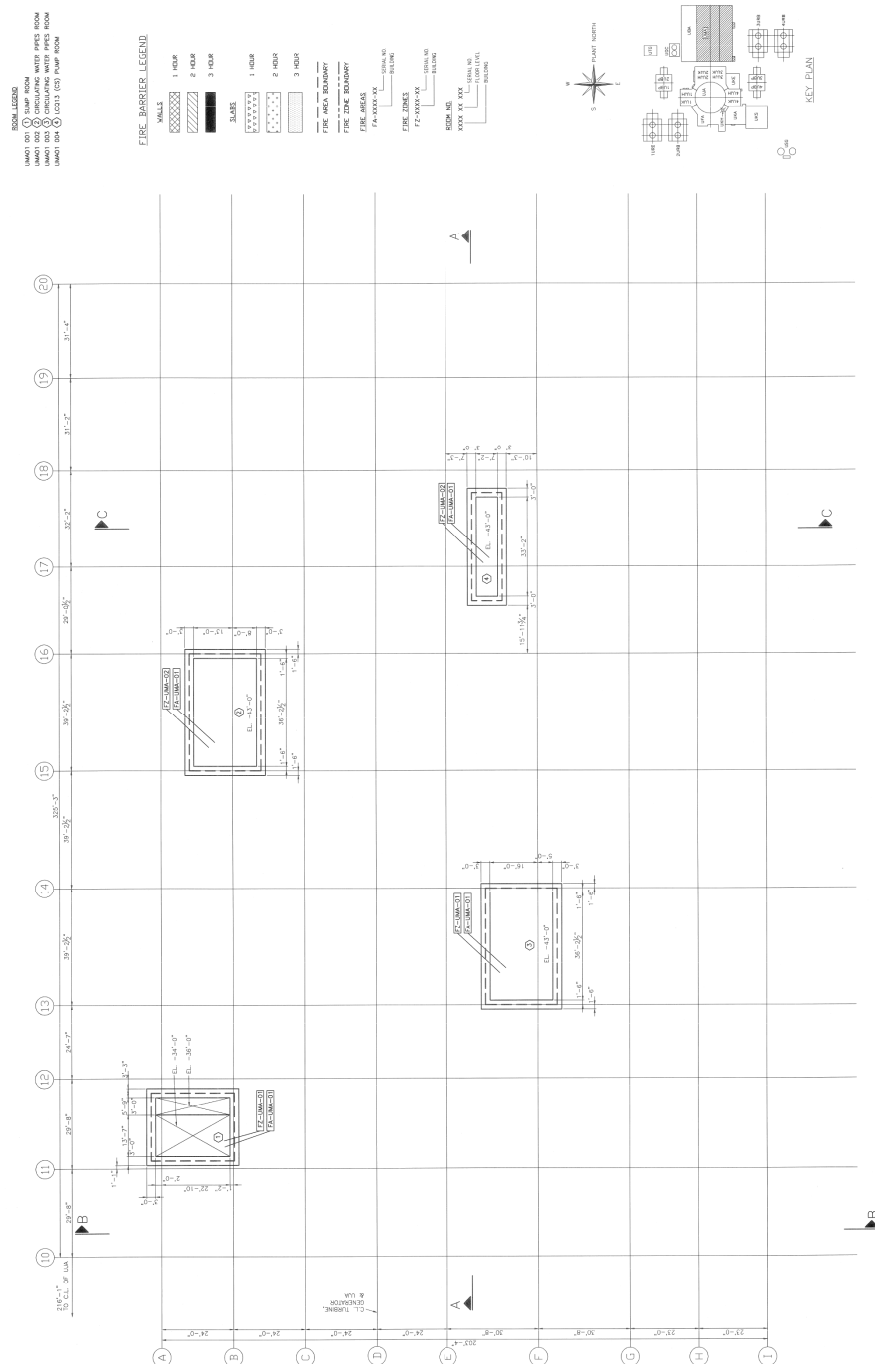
B-6— {CNPP Unit 3 Fire Barrier Building Roof Plan}
